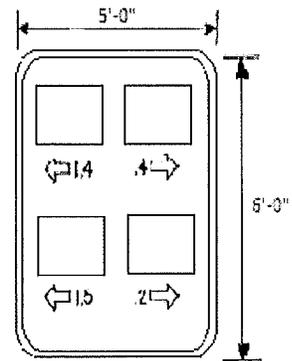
TYPICAL TRAILBLAZER BACKGROUND PANEL DETAIL
